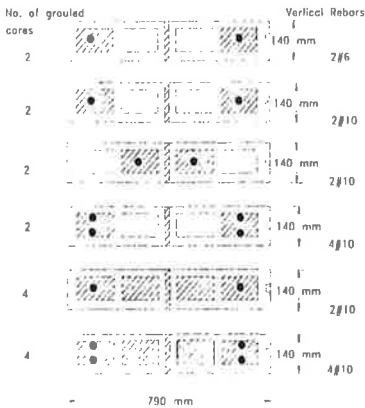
Grout and reinforcement patterns for reinforced specimens
